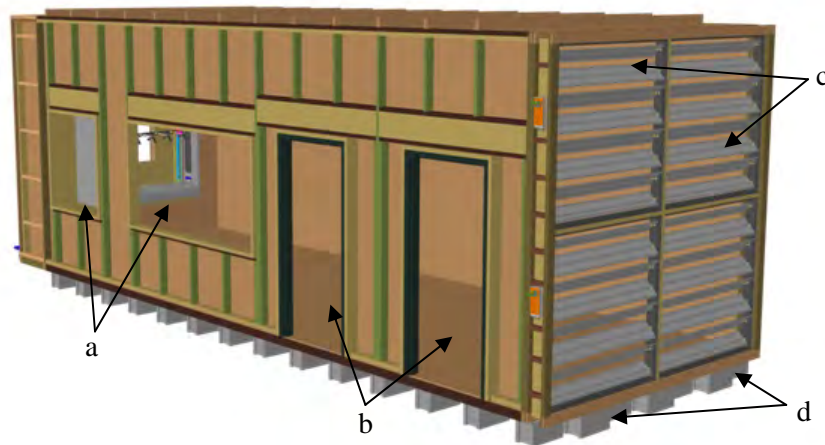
Wind tunnel 3D model design is showing placements of (a) windows, (b) doors, (c) dampers, and (d) concrete blocks.
